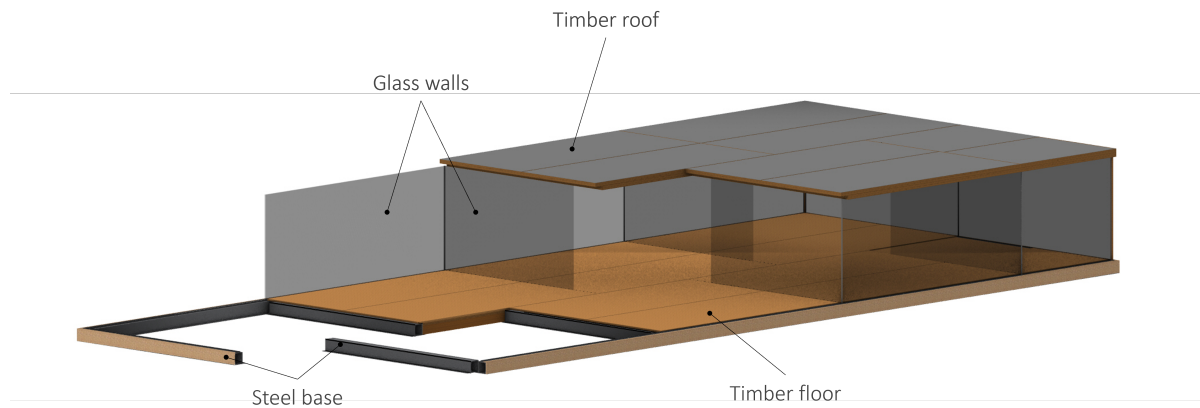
Structure of the pavilion - cut off version to show the structural elements
